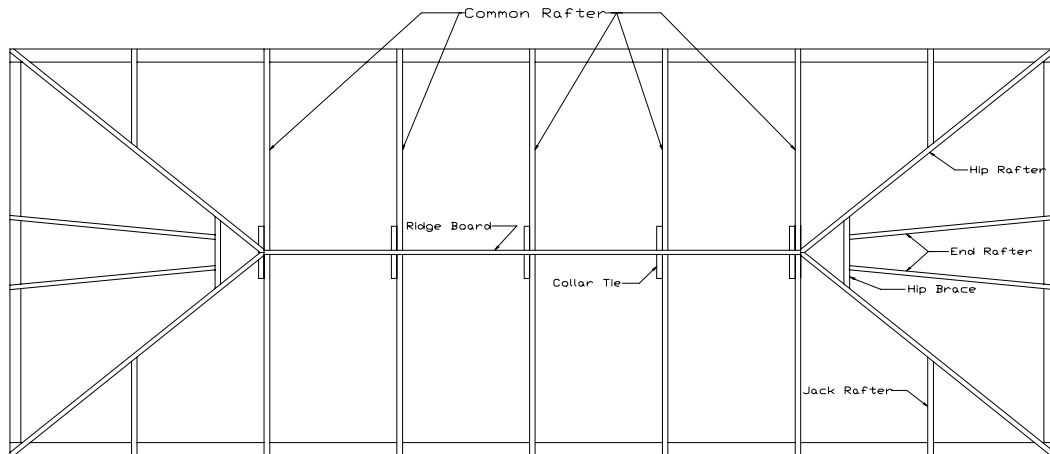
, Framing and floor layout of a GP Medium Hardback.
